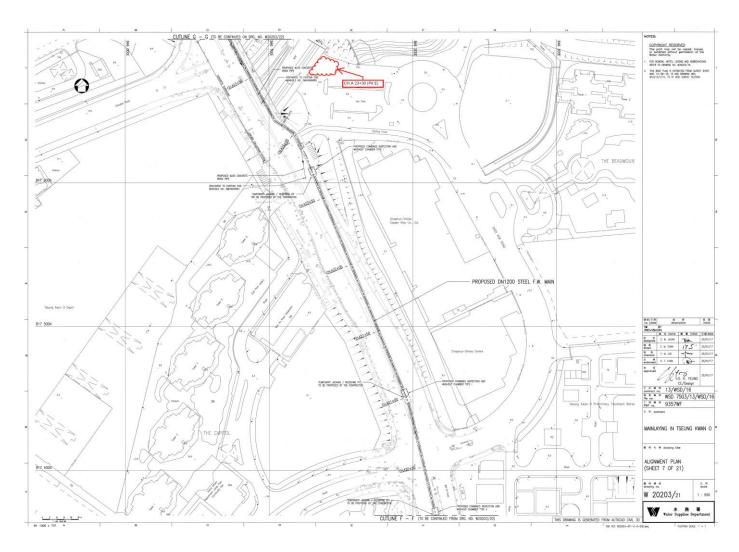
Location Plan for Portion J - A23+30 (Pit E)
